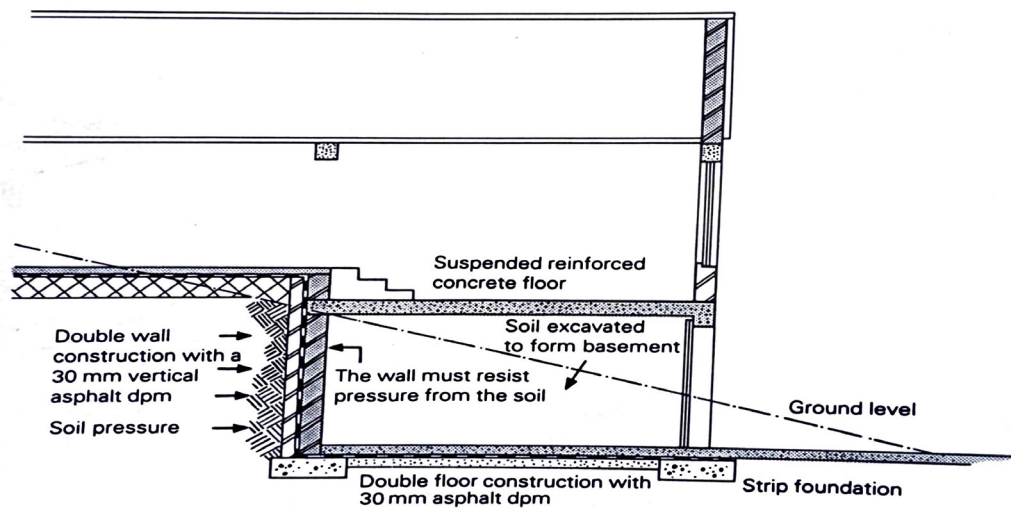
Excavation to create a basement at the lower level of a plot of land.
